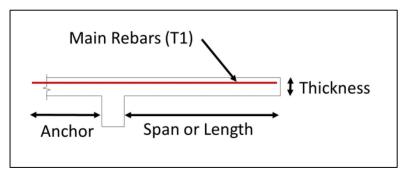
CANTILEVER SLAB (ONLY MAIN REBARS SHOWN)
